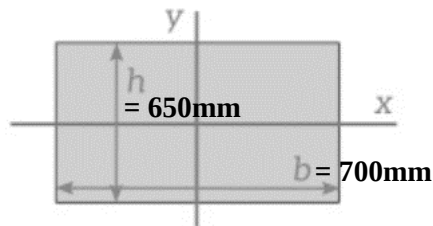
Column cross-section for a design with deformed high-yield steel reinforcement
